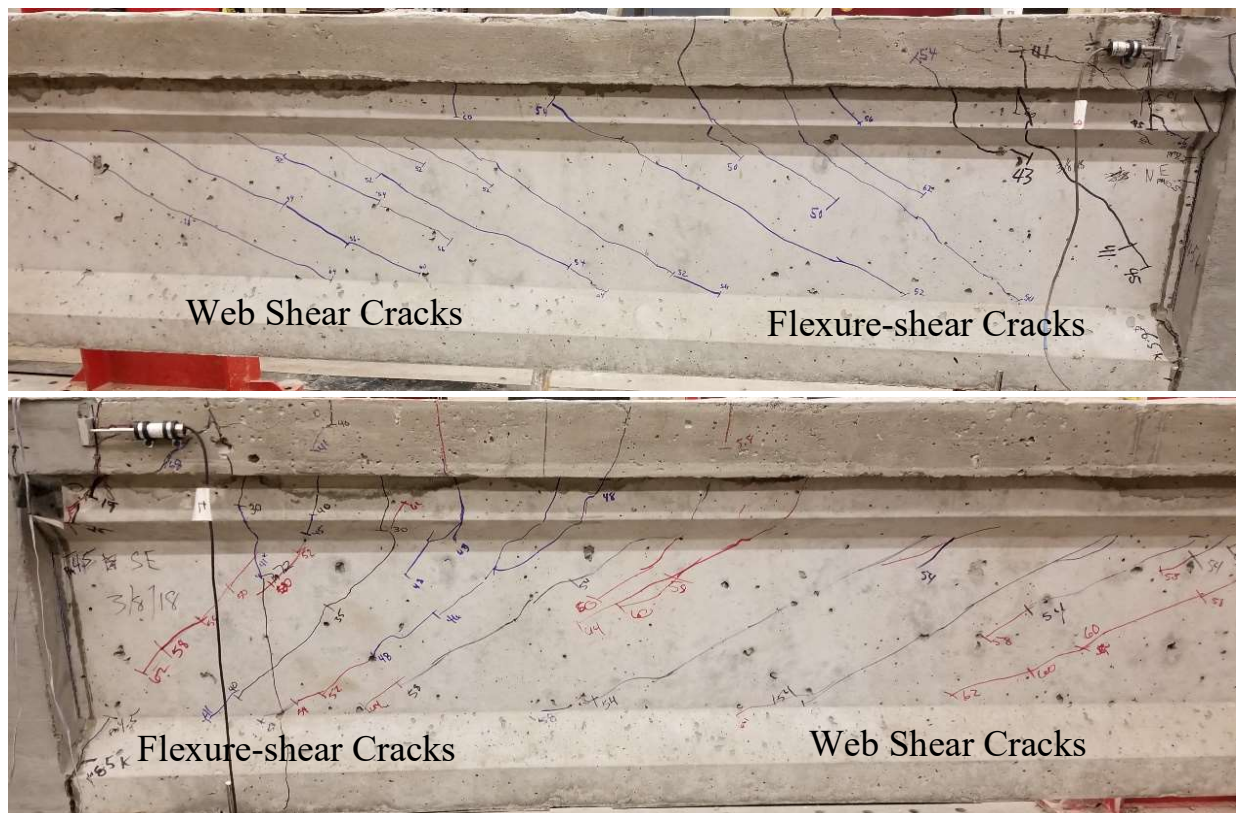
NC3-N girder with flexure-shear and shear cracks top and NC3-S girder with flexure-shear and shear cracks (bottom).
